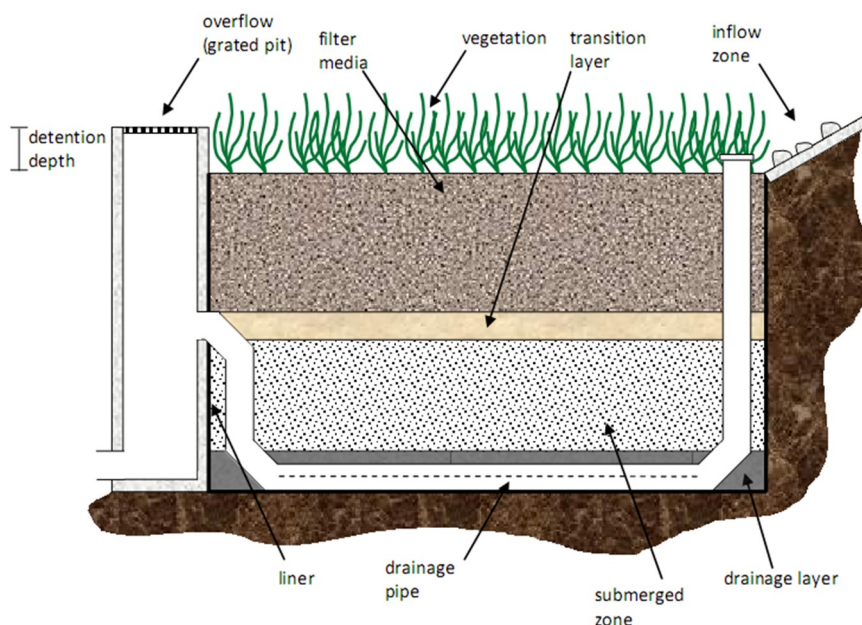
Typical Biofiltration Swale Arrangement (FAWB, 2009)
